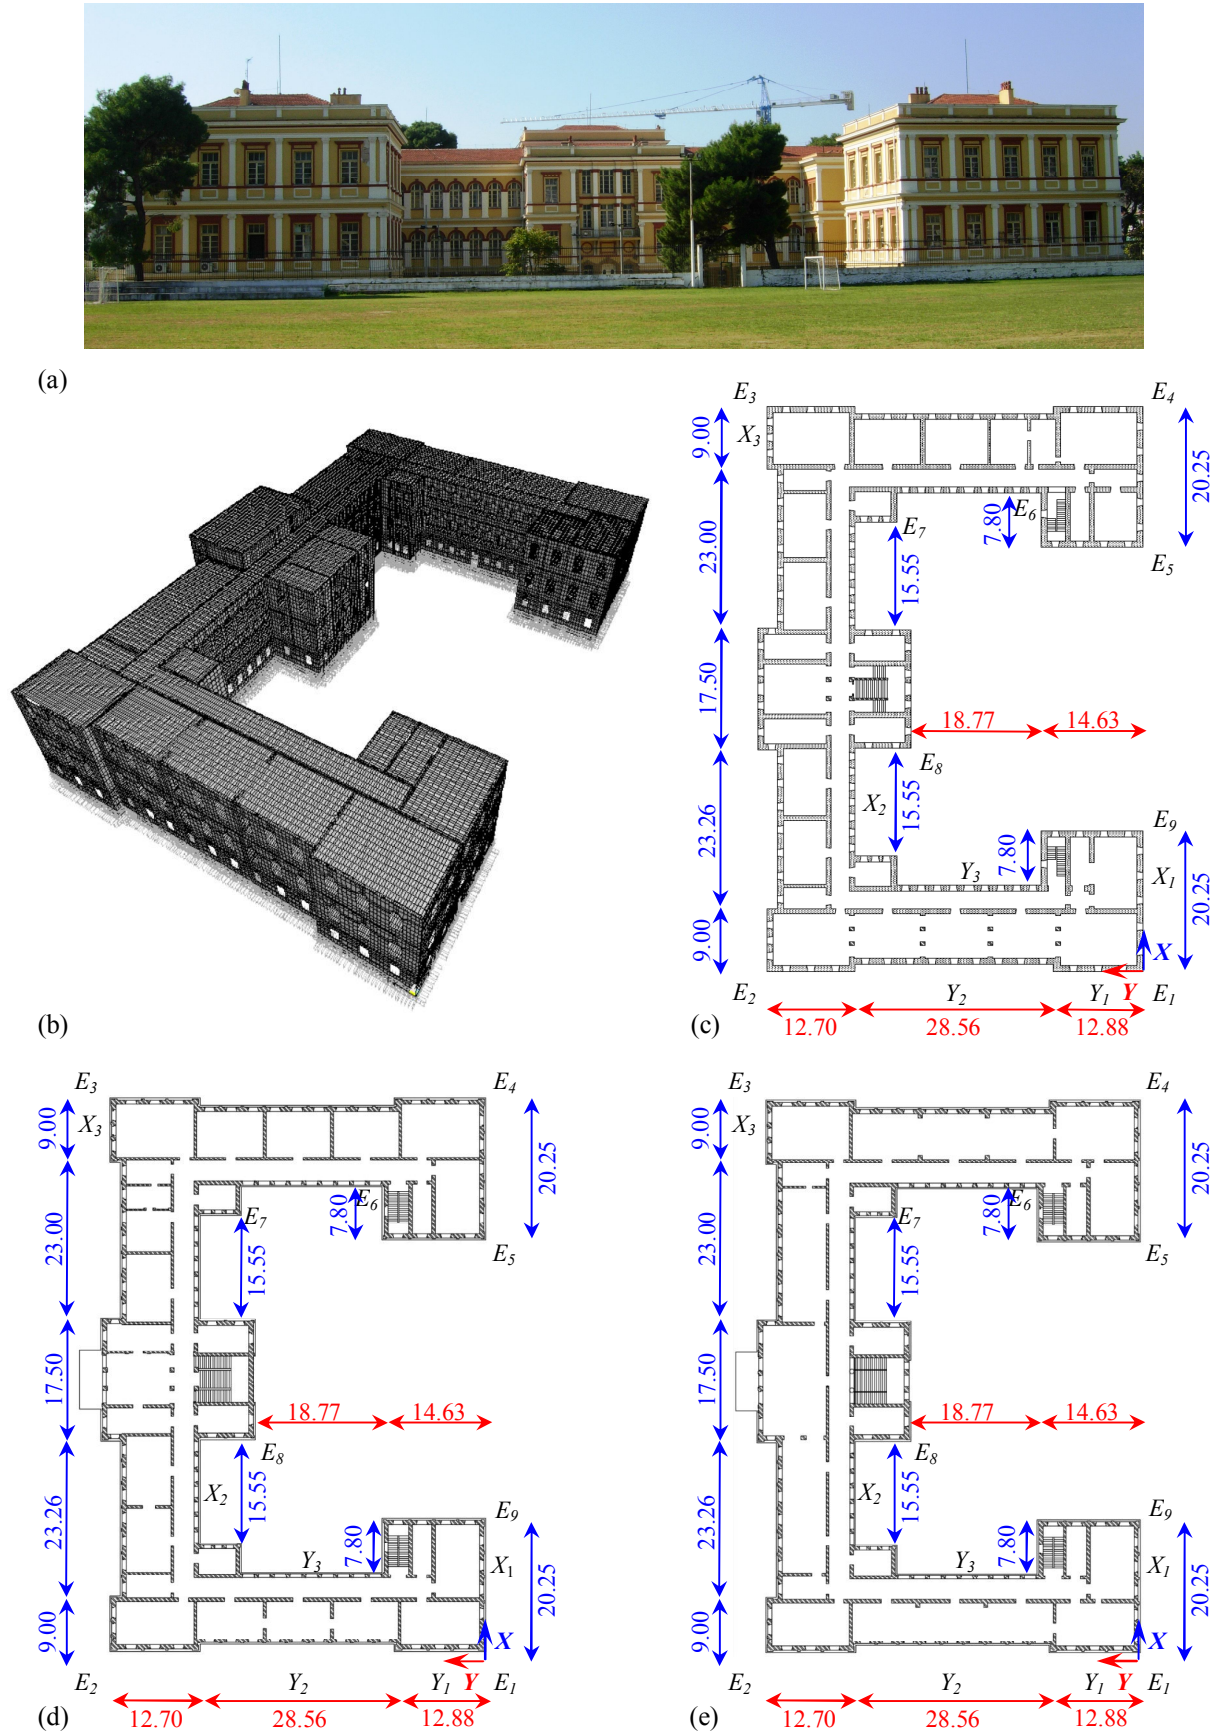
The Papafeio building: (a) North view, (b) 3D finite element model, (c - e) plan views of the 1<sup>st</sup>, the 2<sup>nd</sup> and the 3<sup>rd</sup> storey.
